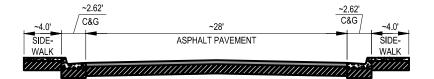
EXISTING GENERAL STILWELL STREET TYPICAL SECTION
